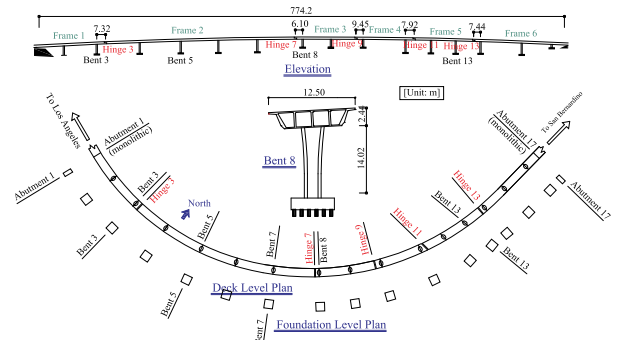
Plan, elevation, and sensor location of the Northwest Connector
